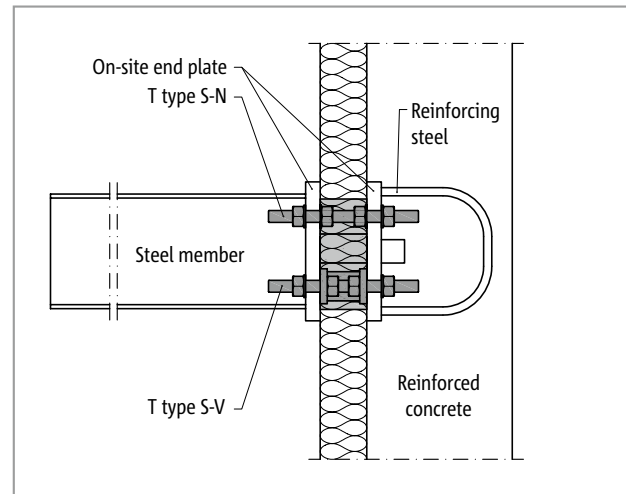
Schöck Isokorb® T type S-N and T type S-V modules for connection of steel structure to reinforced concrete frame
